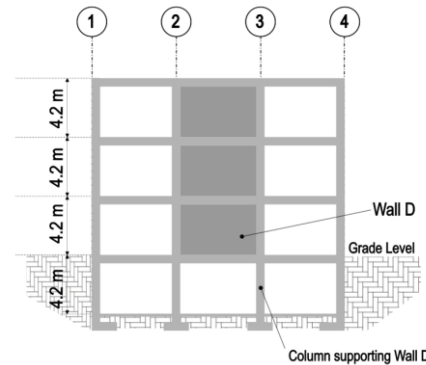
Elevation along Grid D (Adapted from FEMA P-2006).
